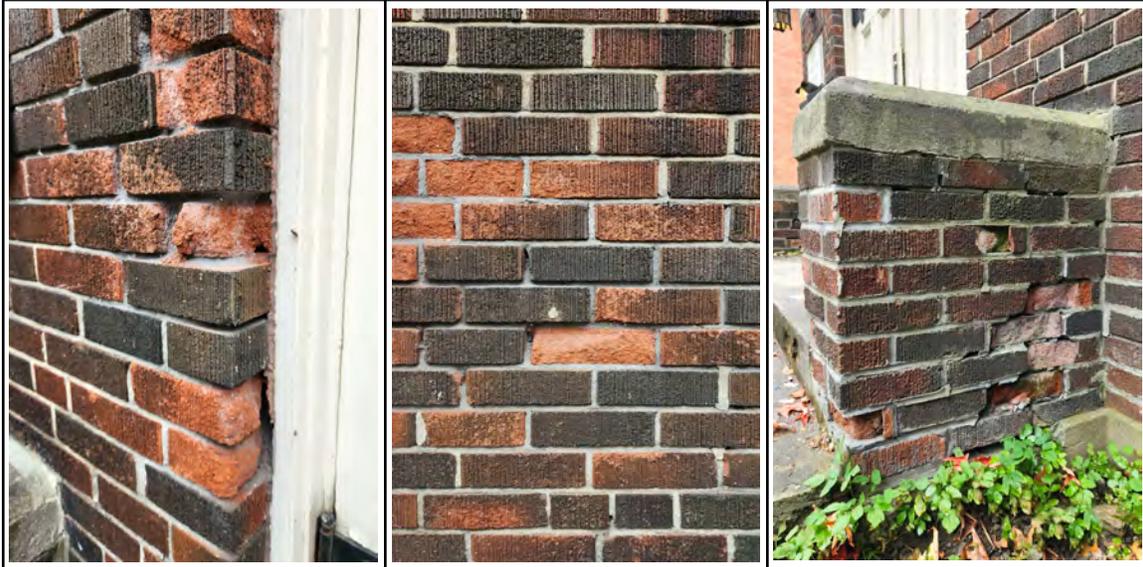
Three views showing typical brick damages observed. Those situated adjacent to window and door openings show greater damages due to additional surface area exposed to the elements, as well as bricks closer to the base of the building which would have been exposed to snowdrifts held against the clay surface (also considering freeze / thaw cycles). Bricks that are closer to orange than brown show greater damages due to the lower temperature of the kiln used in their creation (brown coloured bricks were subject to higher firing temperatures and are therefore more durable).
